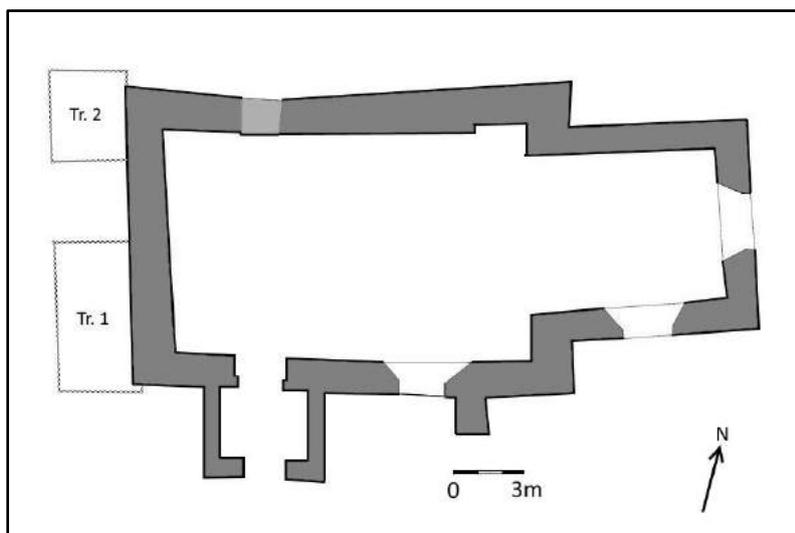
Outline plan of Sutterby church showing position of excavation trenches
